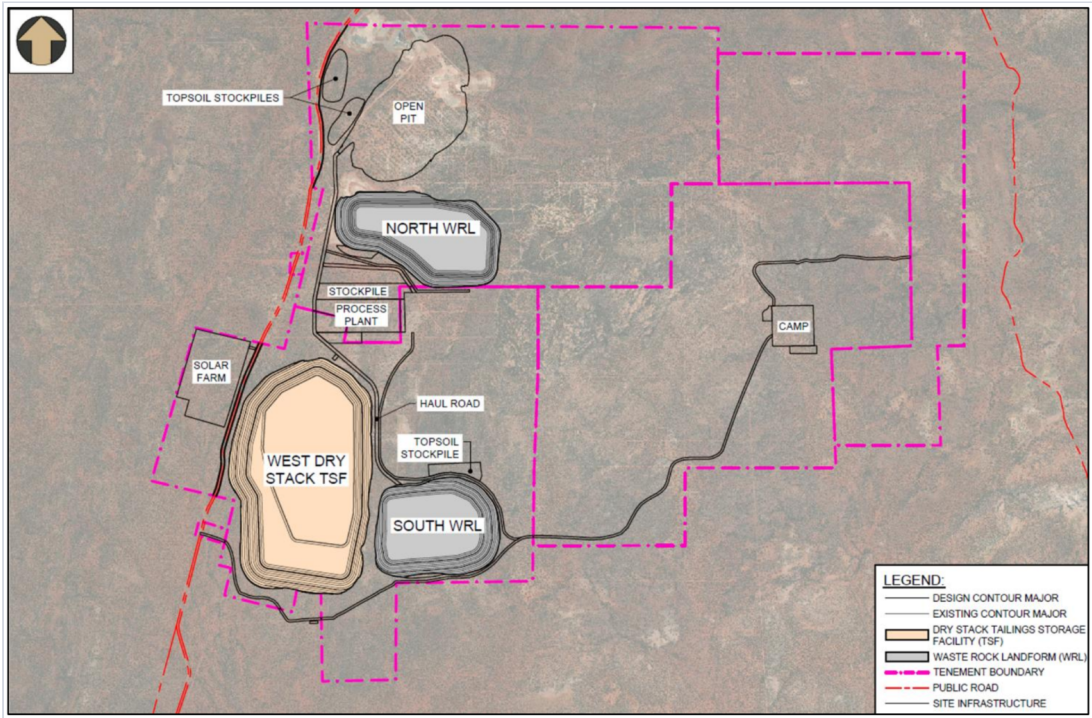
SITE LAYOUT: PROPOSED DRY STACK TSF AND WASTE ROCK LANDFORMS
